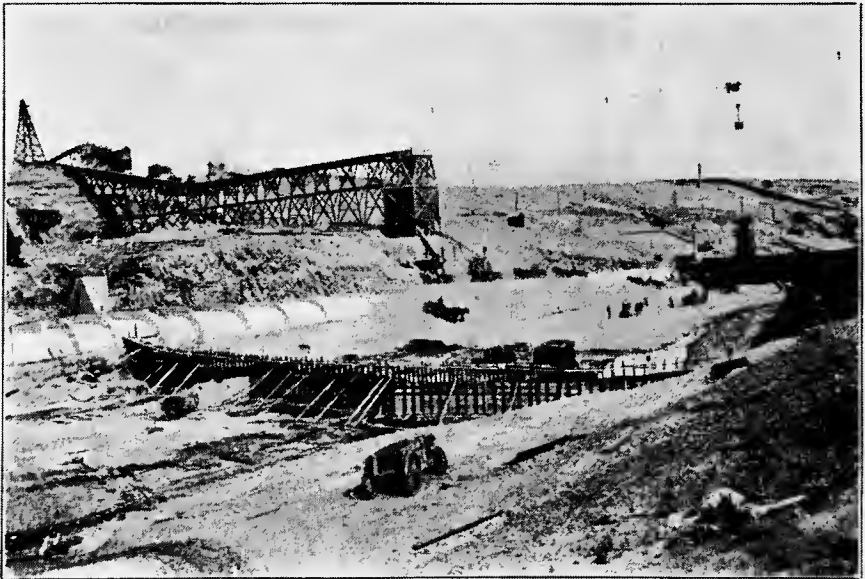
FIG. D.—Foundations for Lahontan Dam, Nev.; showing concrete conduit, conveying water through lower part of dam, with conveying plant in background.
